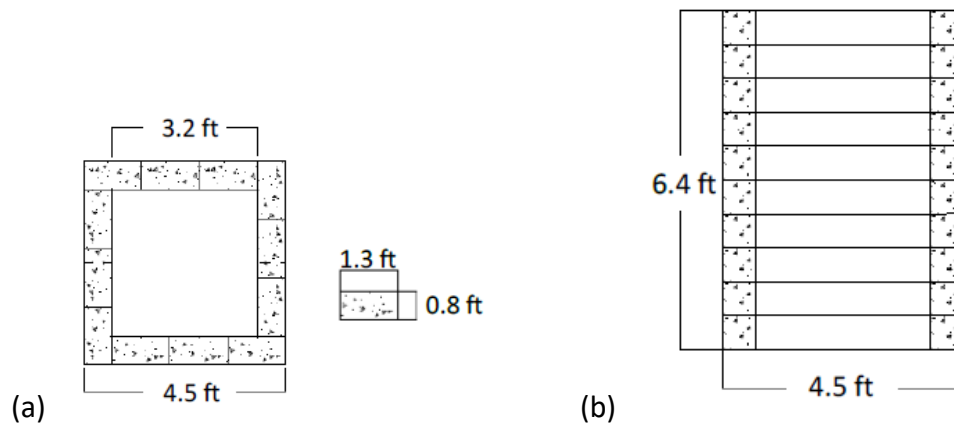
Schematic for the Defiance County (DC) mini-pier: (a) plan view; (b) elevation view (Nicks et al. 2013 – FHWA-HRT-13-066).
